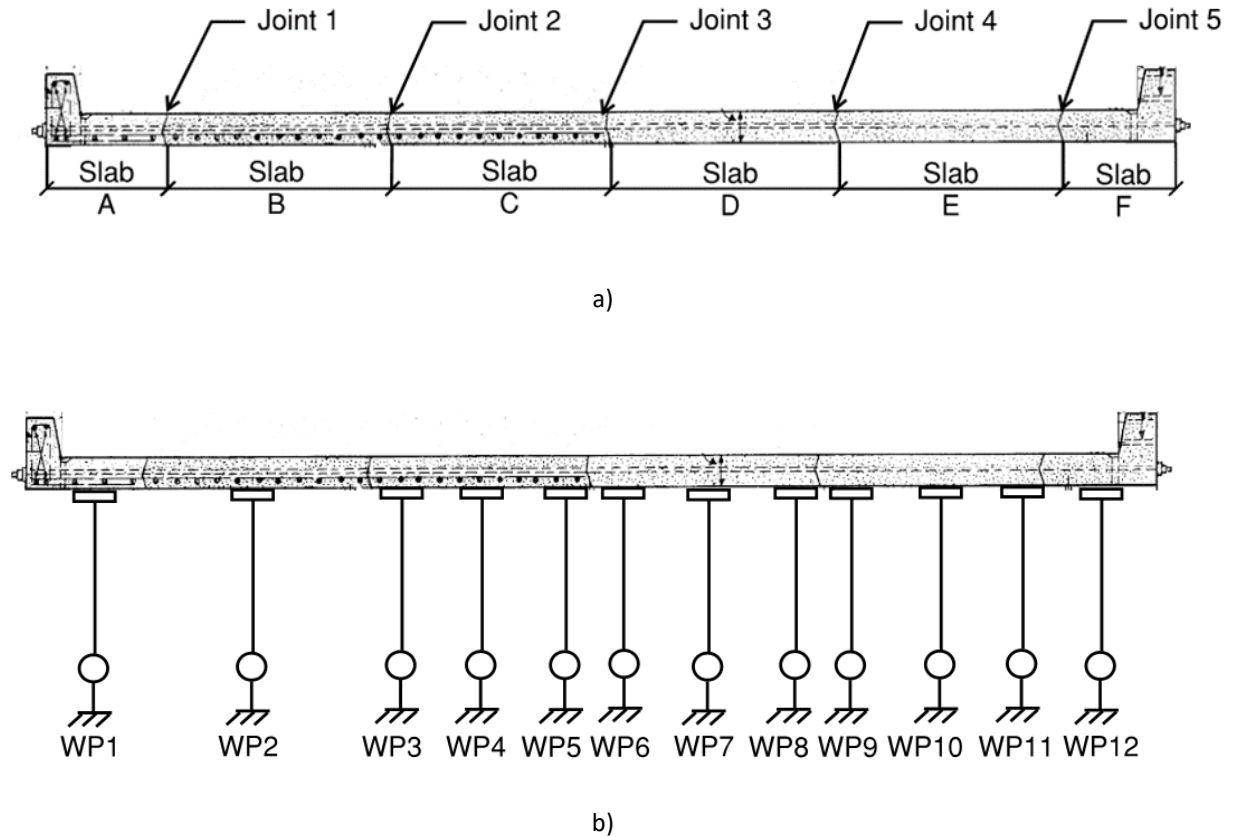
Bridge slab labeling (a) and wire potentiometer locations at mid-span (b)
